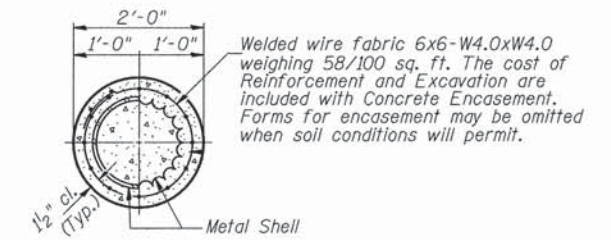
DETAIL OF CYLINDRICAL STEEL SHELL FOR CAST IN PLACE CONCRETE PILES
